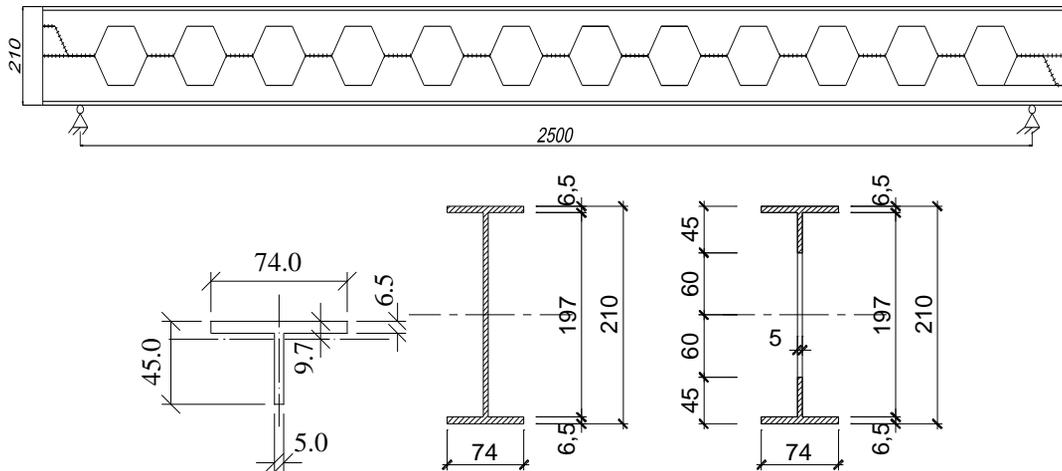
Overall shape and cross-sectional size of the beam without and with openings (mm)
